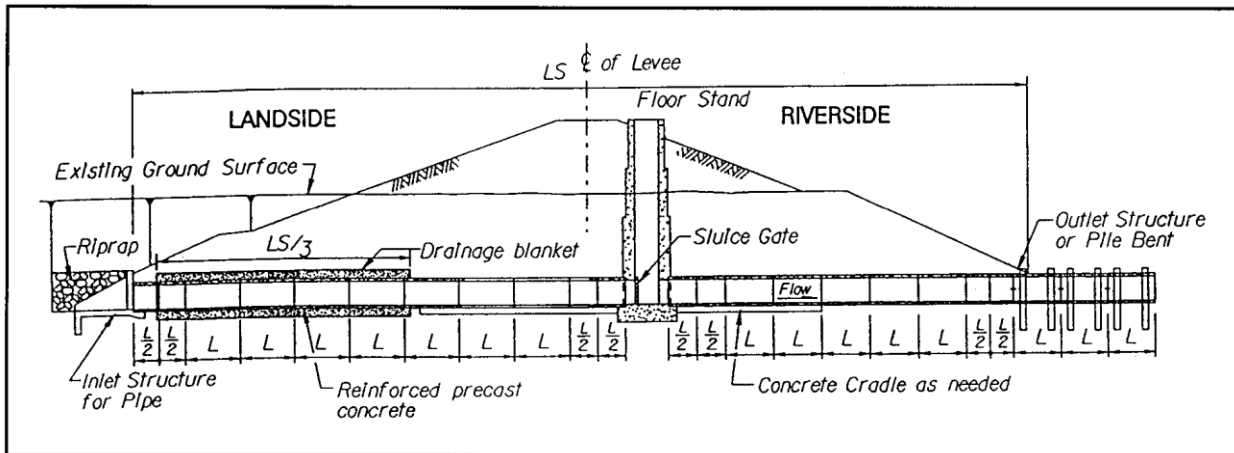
Closure Device for Typical Precast Conduit (Source: USACE, 2000)
